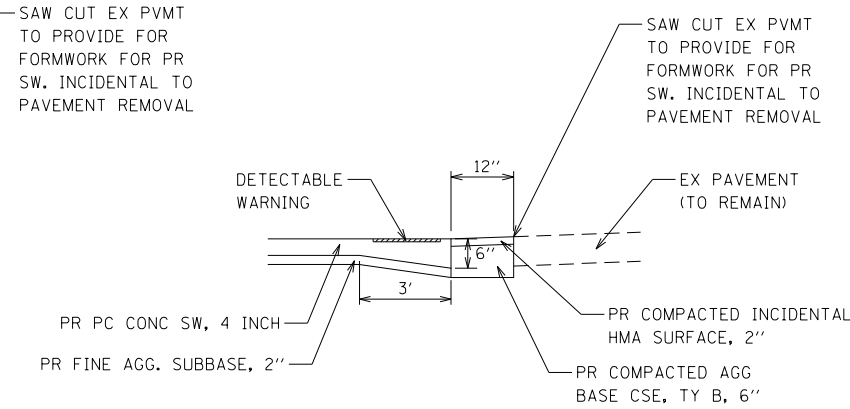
DETAIL SIDEWALK END ABUTTING EXISTING ROADWAY
